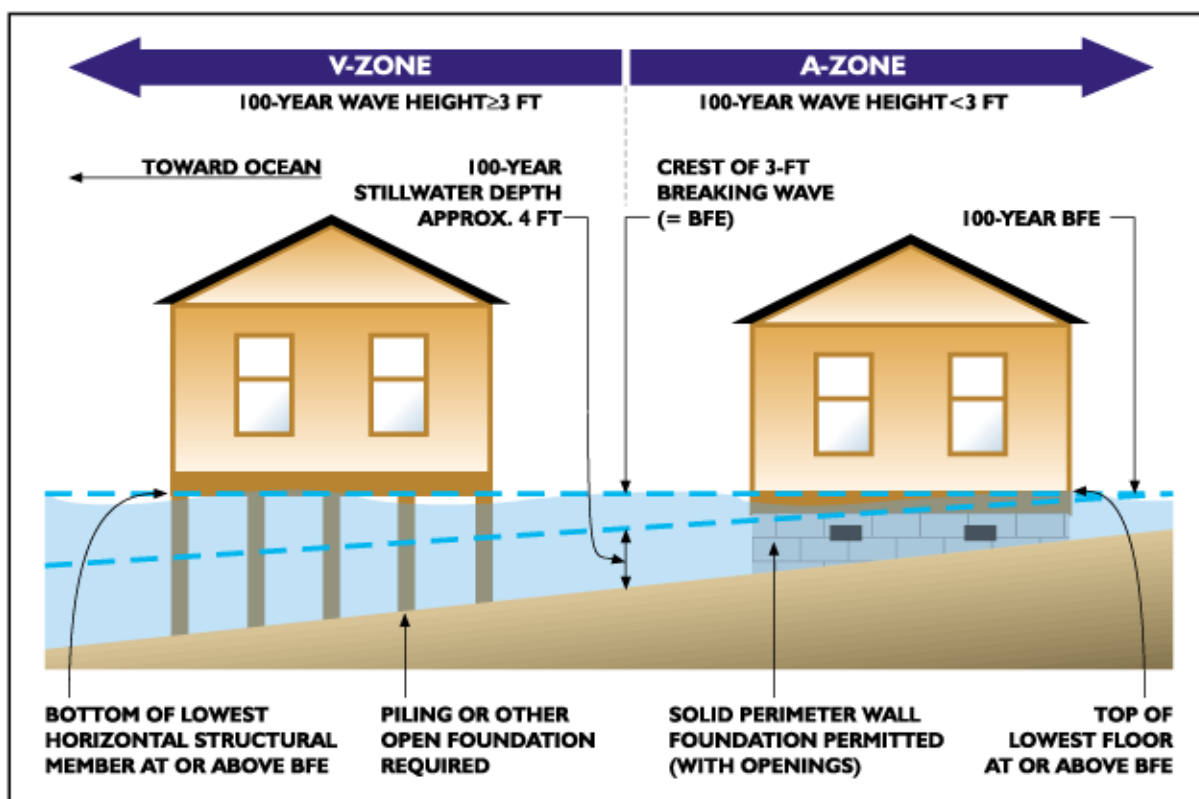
Comparison of building foundation and elevation requirements in V-Zones and A-Zones.
